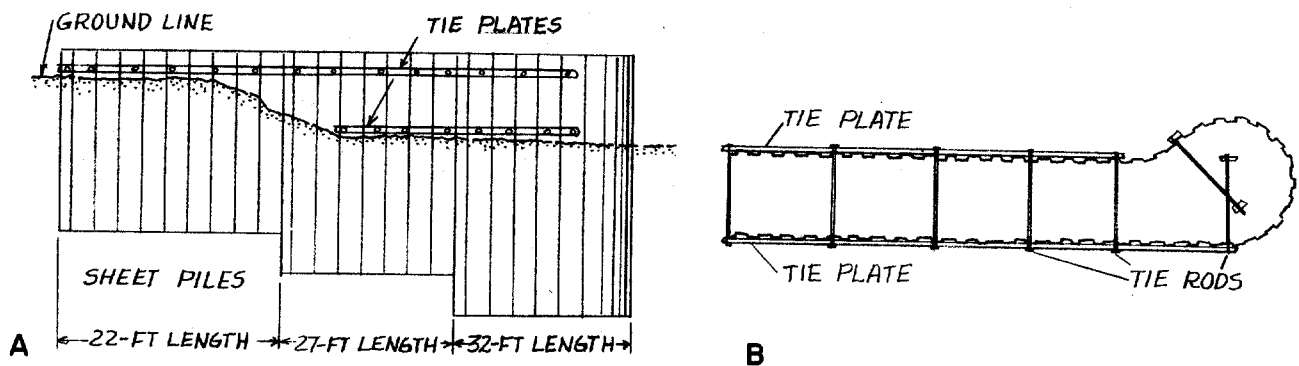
A, elevation and B, plan view, of sheet pile spur.
